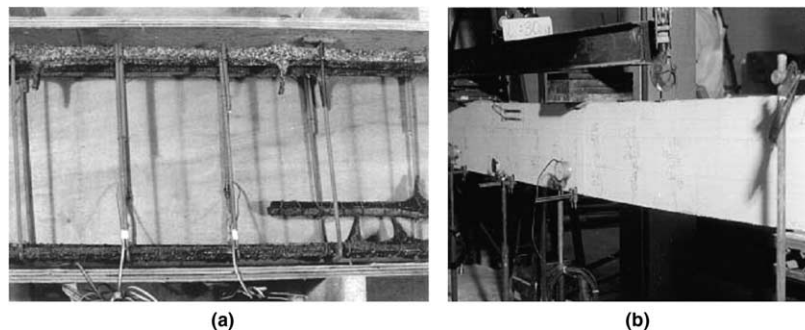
Bamboo reinforcing concrete beams. (a) Detail of bamboo reinforcement in beam. (b) Bamboo reinforced concrete beam test.
